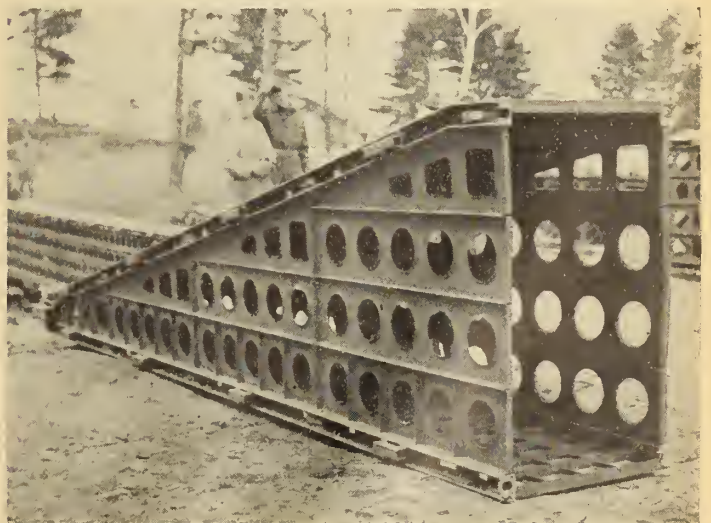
16 ft. Hornbeam section (4 bays) assembled, ready for attaching to standard bay.
